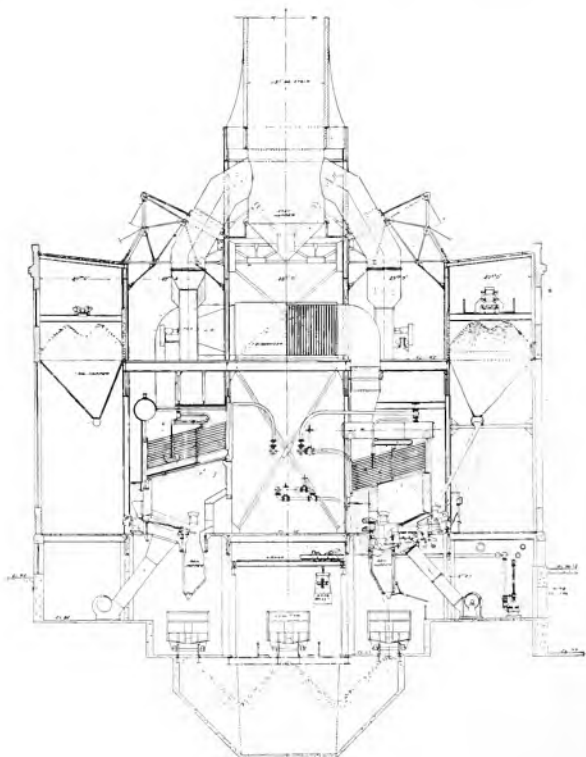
Traverse Section at Stacks in Boiler Room, Central Power House, Erie Works
